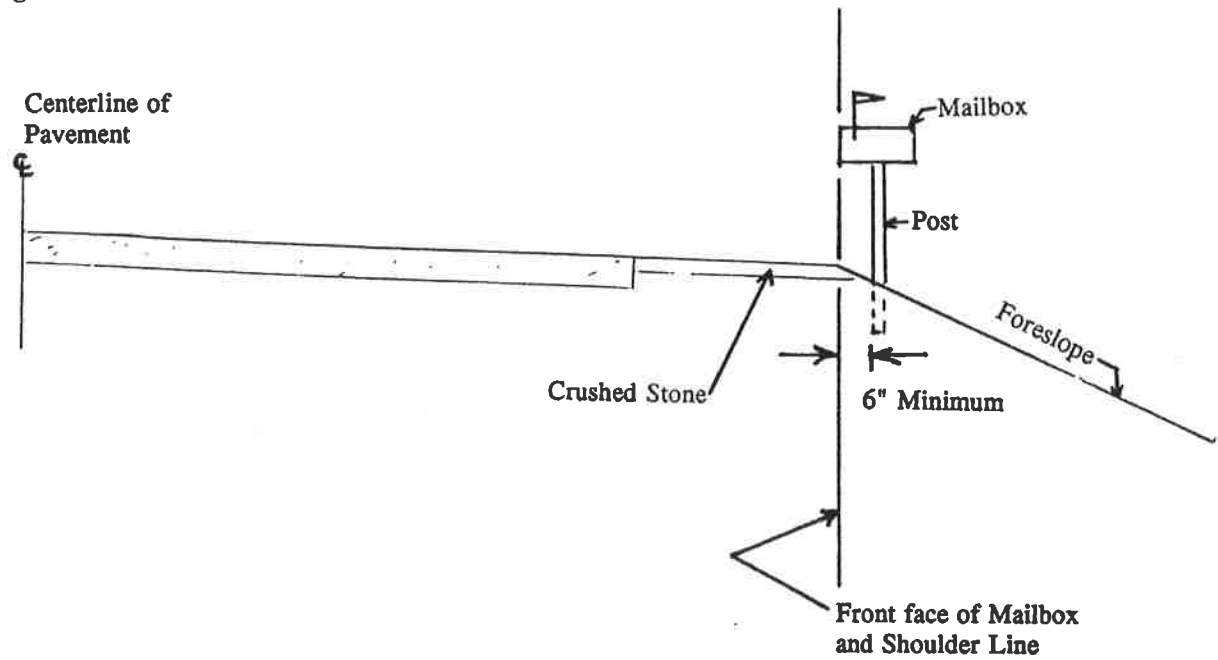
Typical Rural Road Cross-Section (Pavement with Open Ditches).
